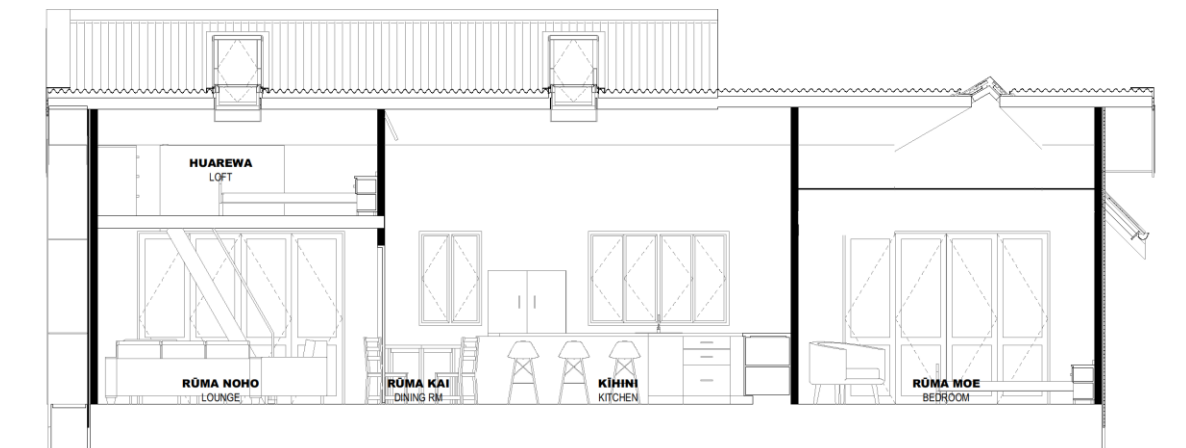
One-bedroom house section. Loft above lounge accessed via loft ladder.
